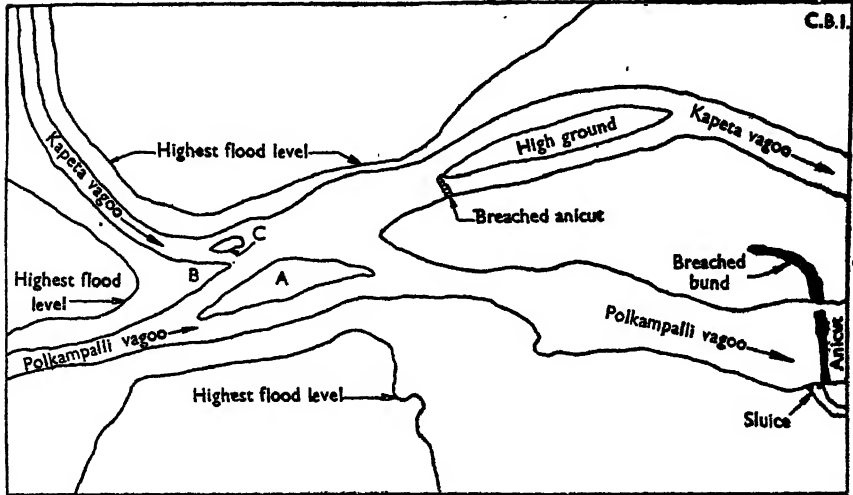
C. 13: *Survey plan of Musapet Headworks
